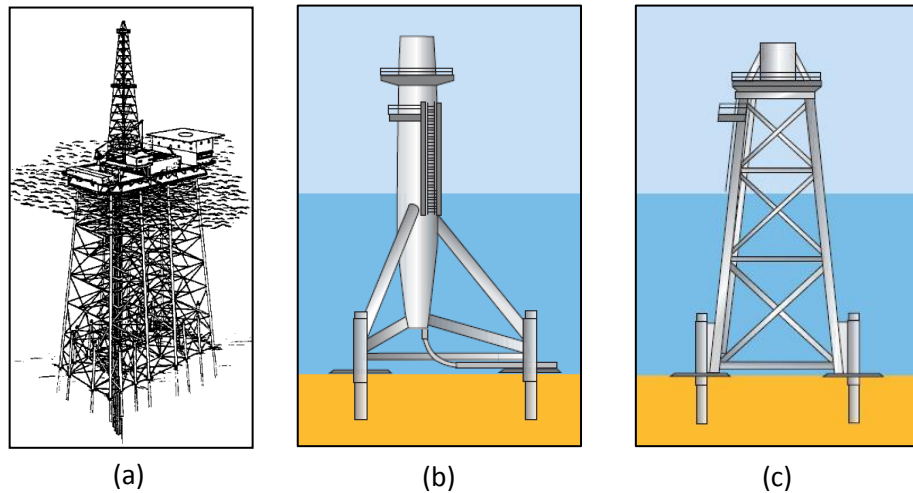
(a) Jacket platform (Ben C. Gerwik Jr, 2007); (b) (c) common foundation for wind turbines, tripod and jacket respectively (EWEA, 2011)
